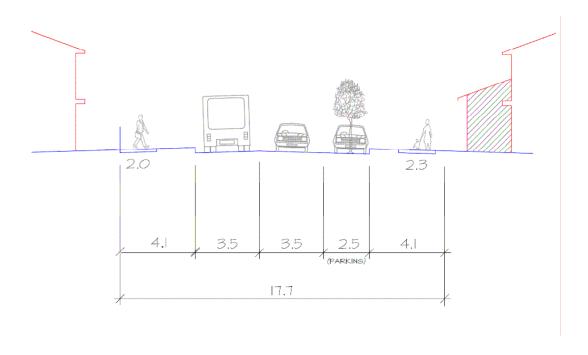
Neighbourhood Connector B – Typical Cross-section with On-Street Parking on One Side
